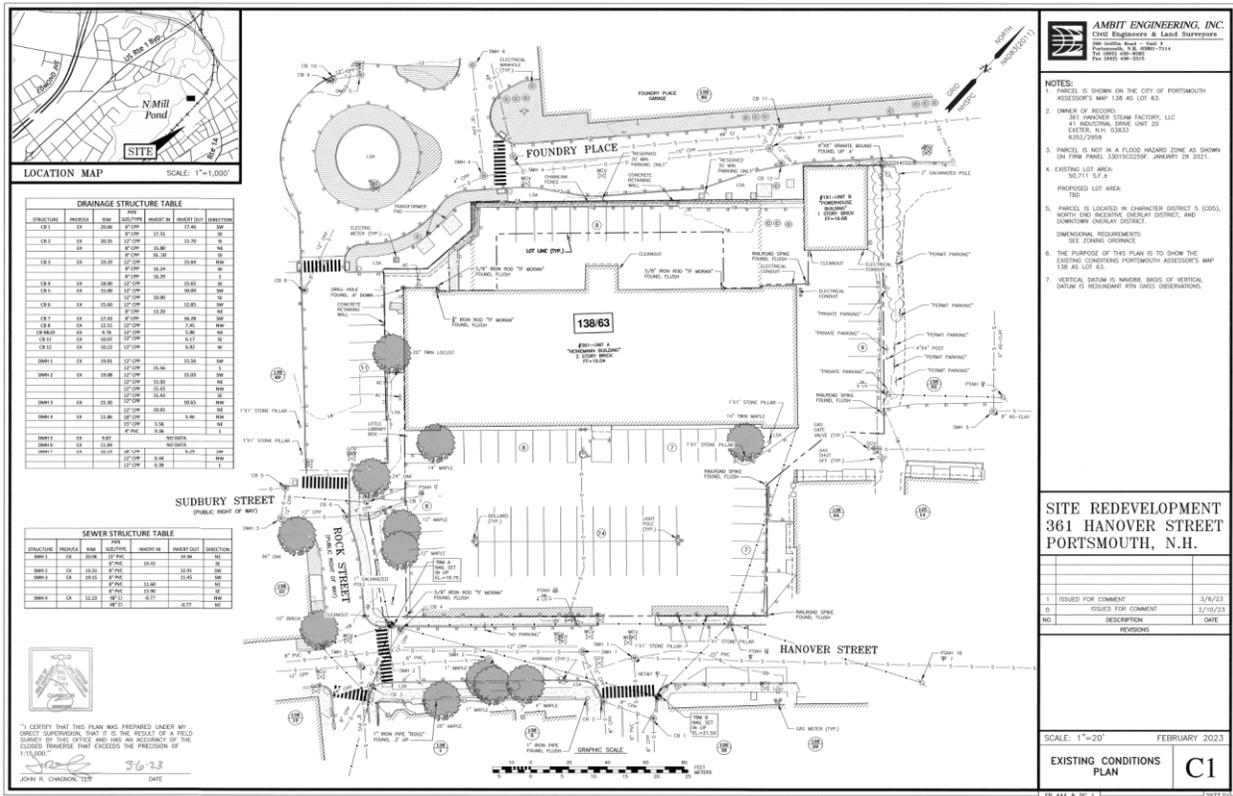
Existing Conditions (includes the former Powerhouse Building)
